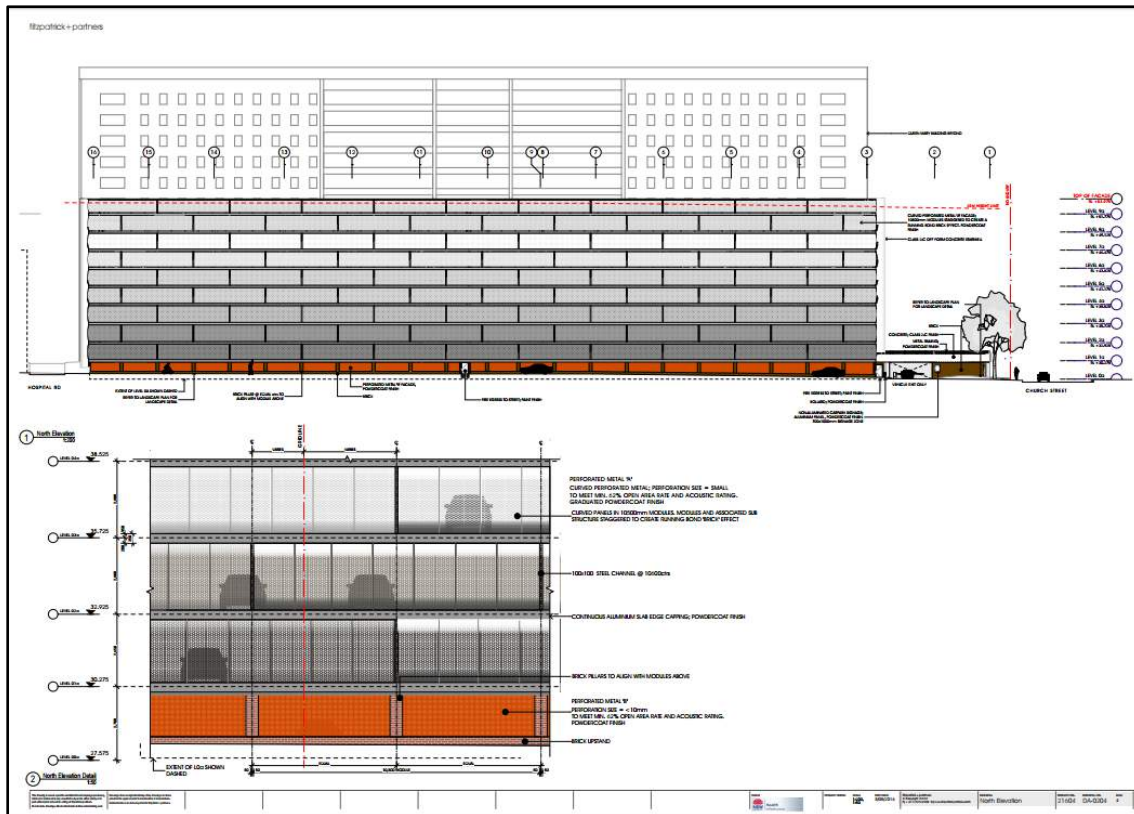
DA-0204 North Elevation Detail. (Source: Fitzpatrick + Partners, 05.05.2016).
